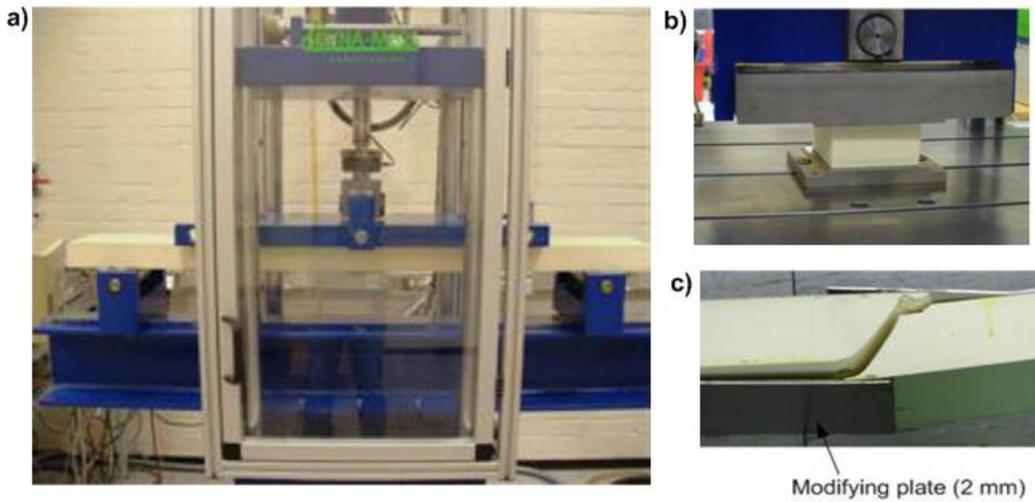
four-point bending; Figure 6b): Compressive test; Figure 6c): Shear failure
